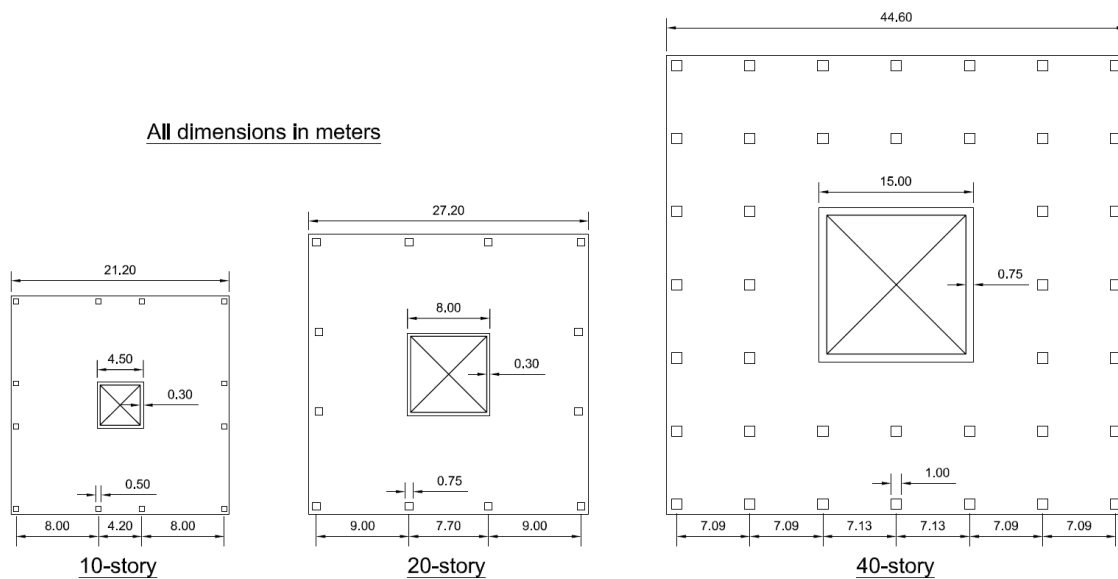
Floor plan-view of the 10-, 20-, and 40-story buildings.
